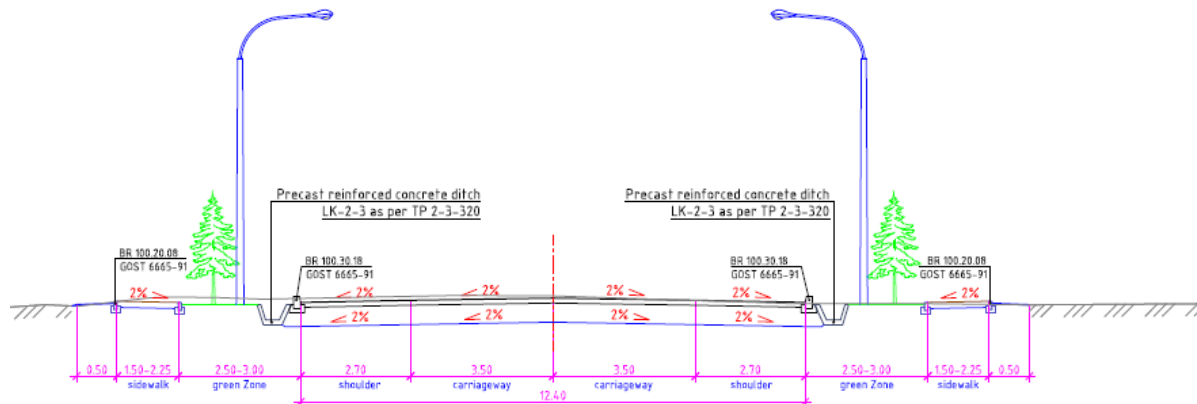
Typical cross section in urban area (category III) of Dangara-Okmazor road section with one sidewalk km 40.0 - km 68.7
